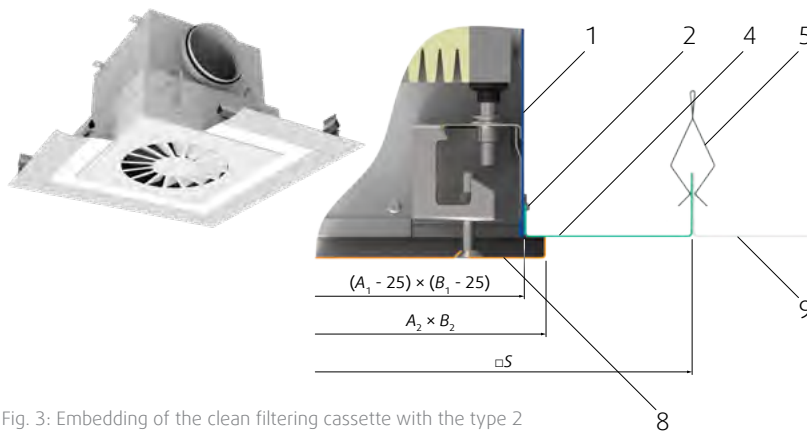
Embedding of the clean filtering cassette with the type 2 front panel fitting surface into a metal plate suspended ceiling
